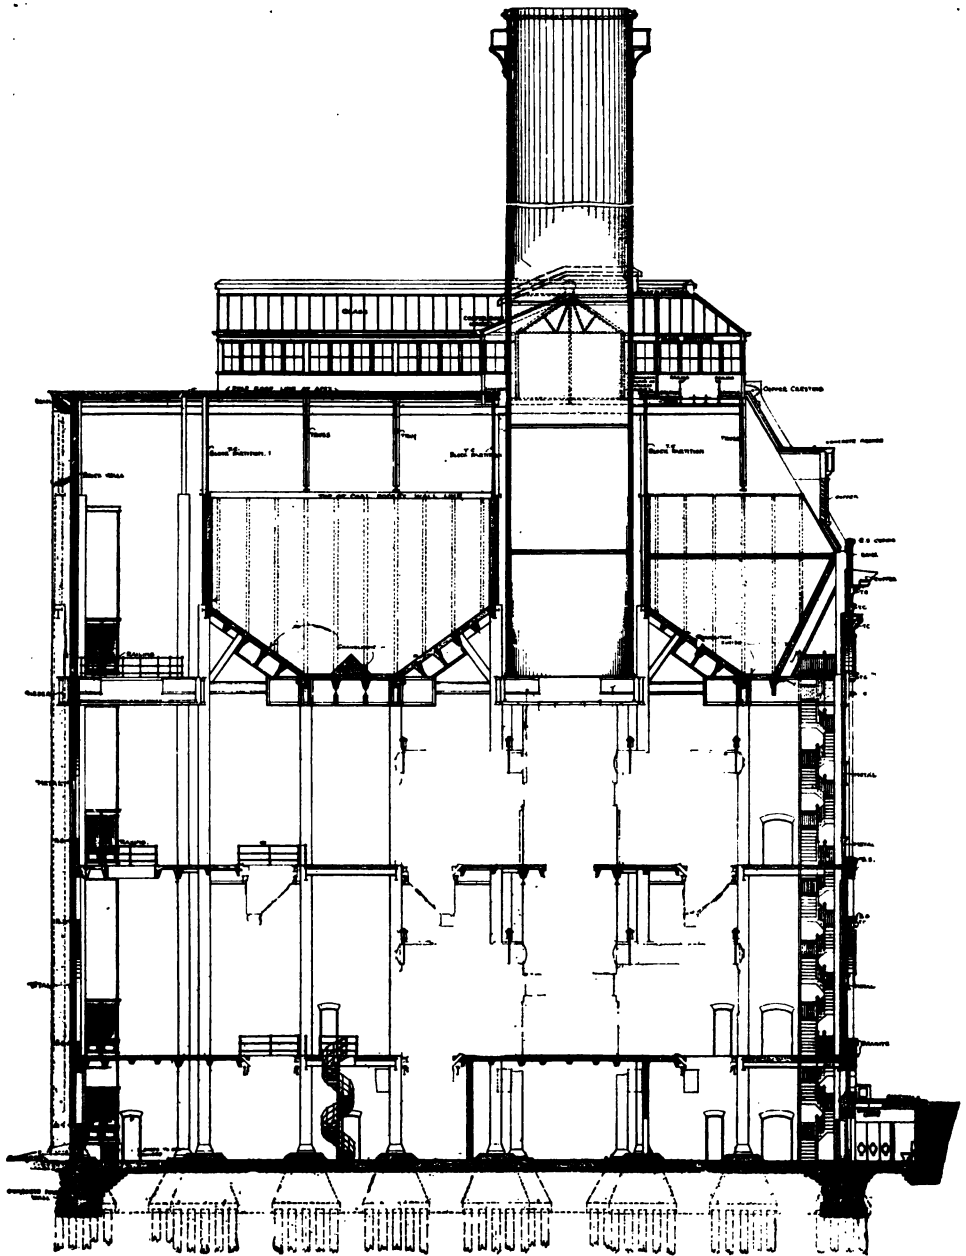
Longitudinal Section on Line C-D, Williamsburg Station.
